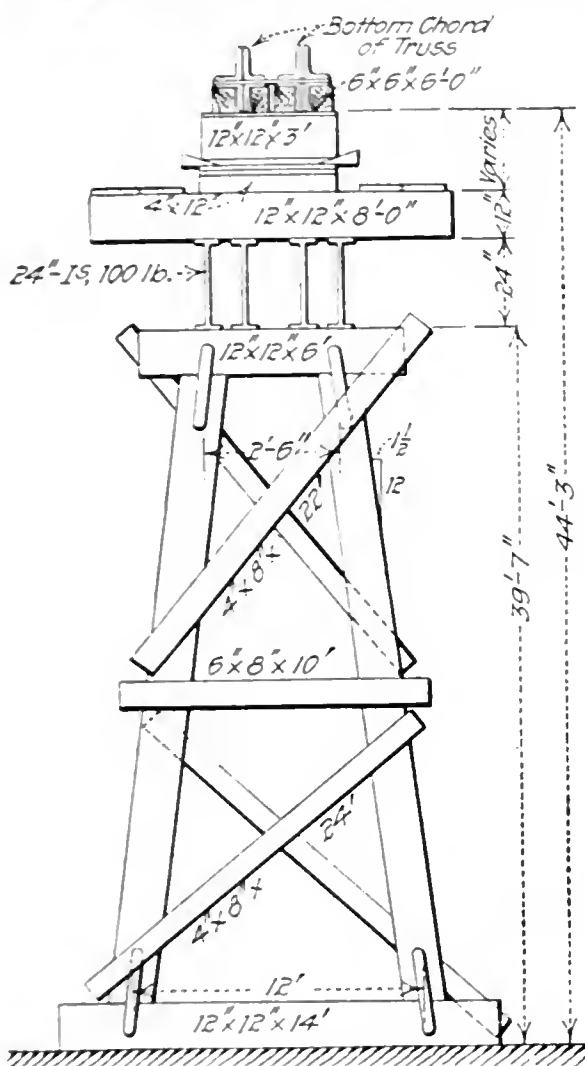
TYPICAL BENT OF ERECTION FALSEWORK
